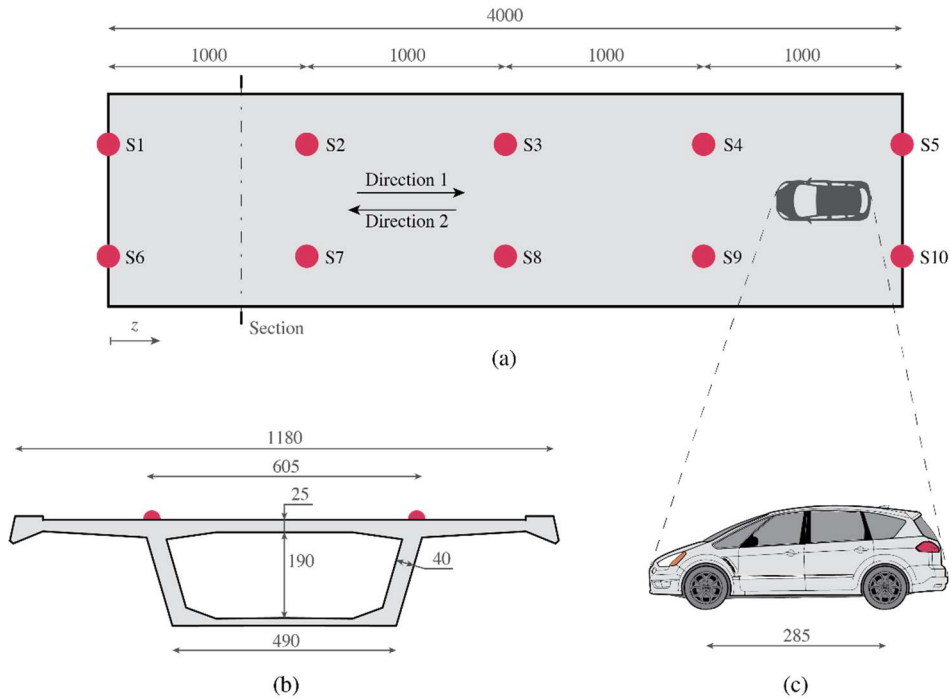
Plan (a) and section (b) views of the bridge spans, adapted from [9], and car scheme (c); dimensions in cm
